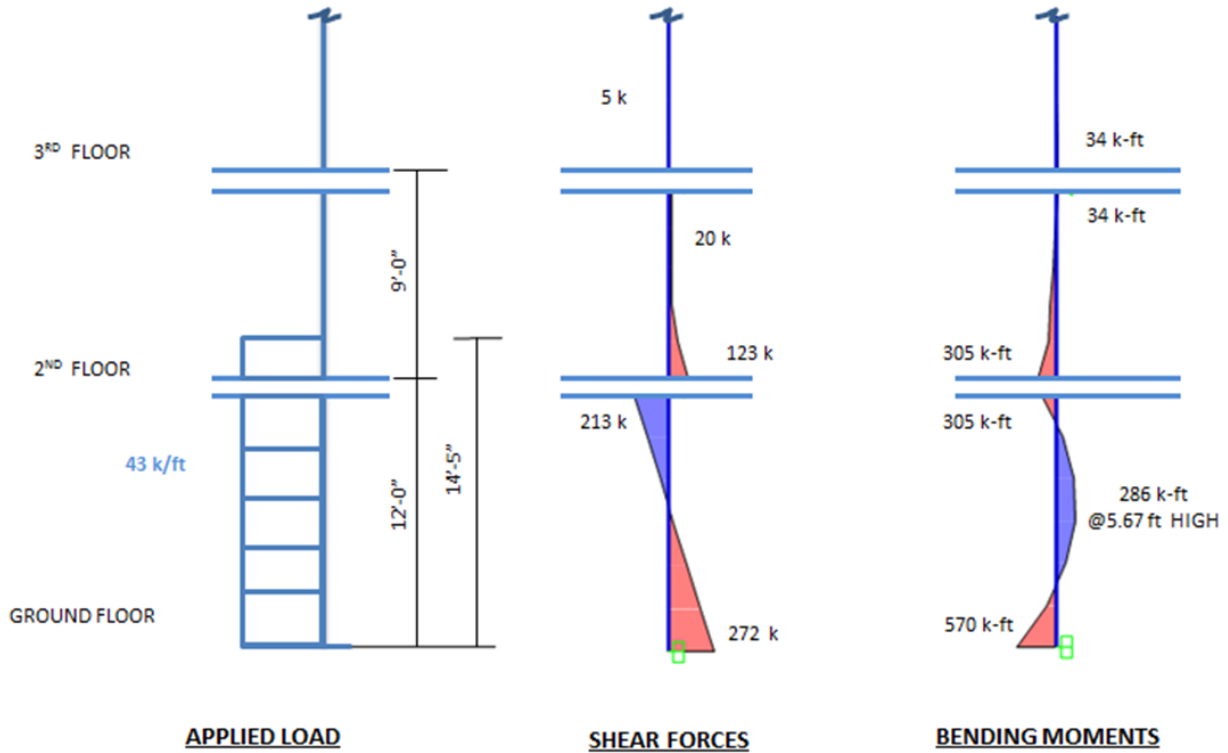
Hydrodynamic loading on exterior column of Monterey residential building due to Load Case 2
